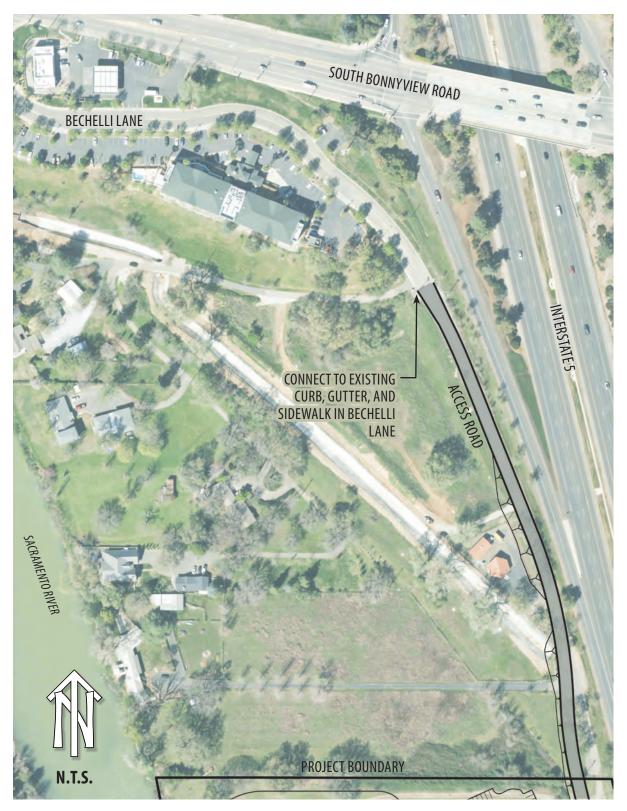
PROPOSED PROJECT NORTH ROAD CONNECTION
